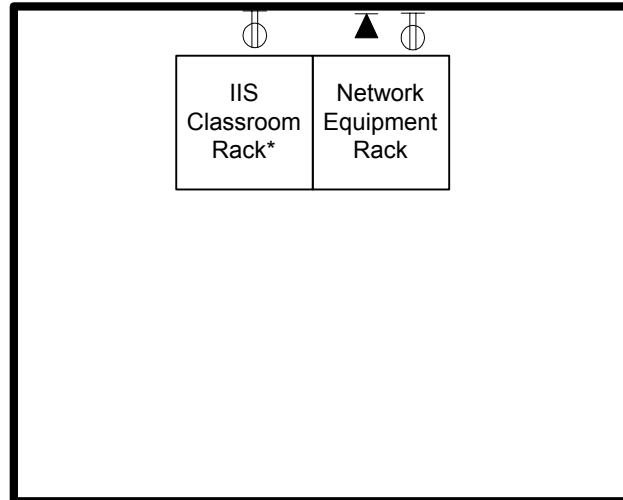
MMS 600 Network Equipment Rack and IIS Rack Room Layout
